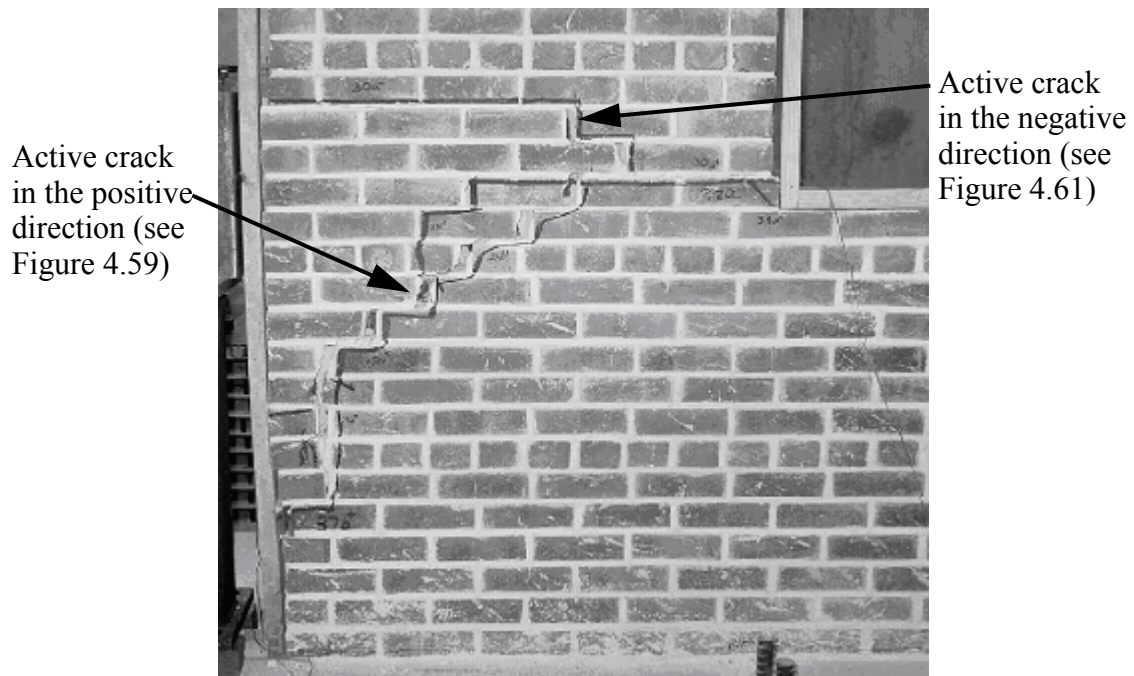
Horizontal and diagonal crack at the base of pier PA-9 following Test Run 39 (note, this photograph was taken from inside the structure).
